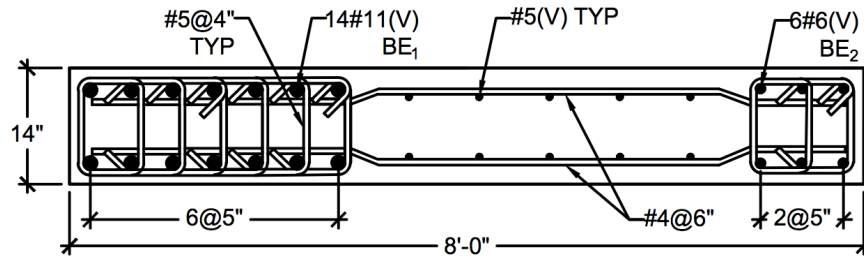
Archetype 6H-DR-2.0 Level 1 Wall Detail
